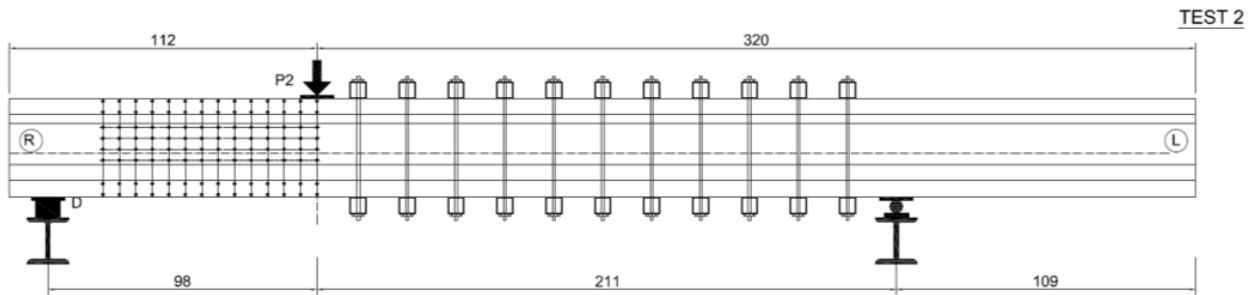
Beam 1 Test 2 Configuration (dimensions in inches).
